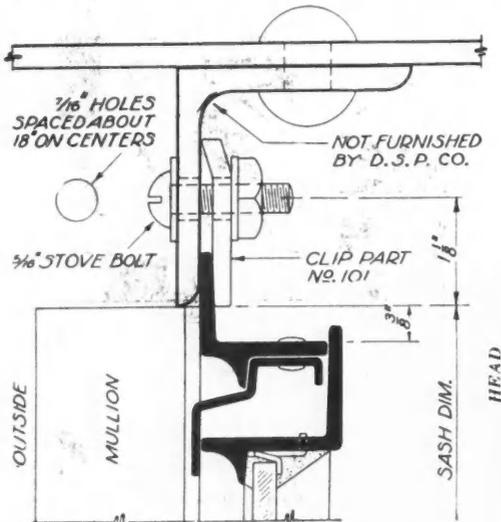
Detail of Steel Lintel Construction Which Is Preferred for Wide Openings.
